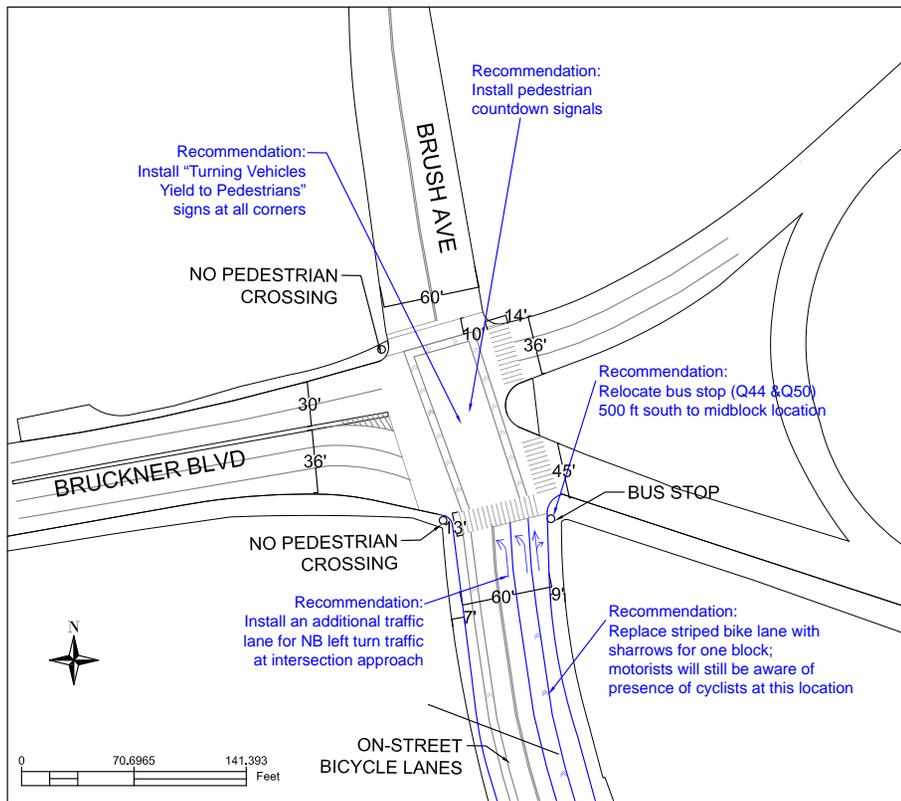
Intersection of Brush Avenue and Bruckner Boulevard with proposed improvements
